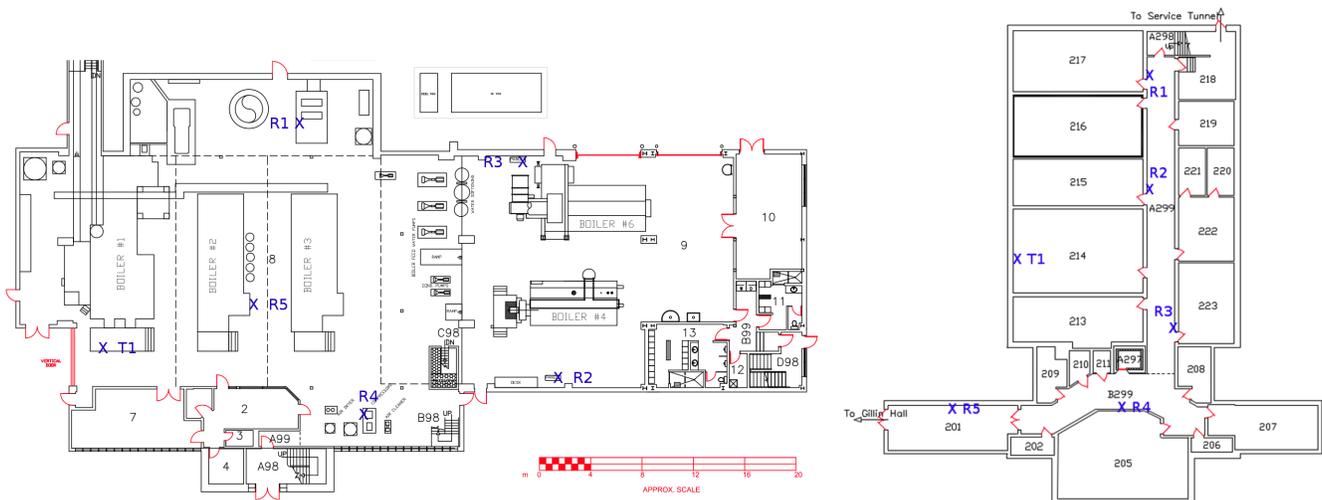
Floor plan and mote placement at the UNB central heating plant (left) and UNB ITC building (right).
